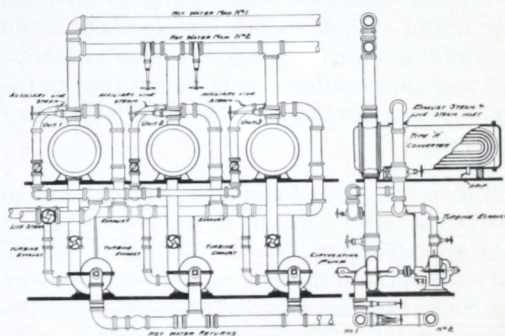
Typical Piping Plan of 3 Type "R" Convertors Connected in Parallel
